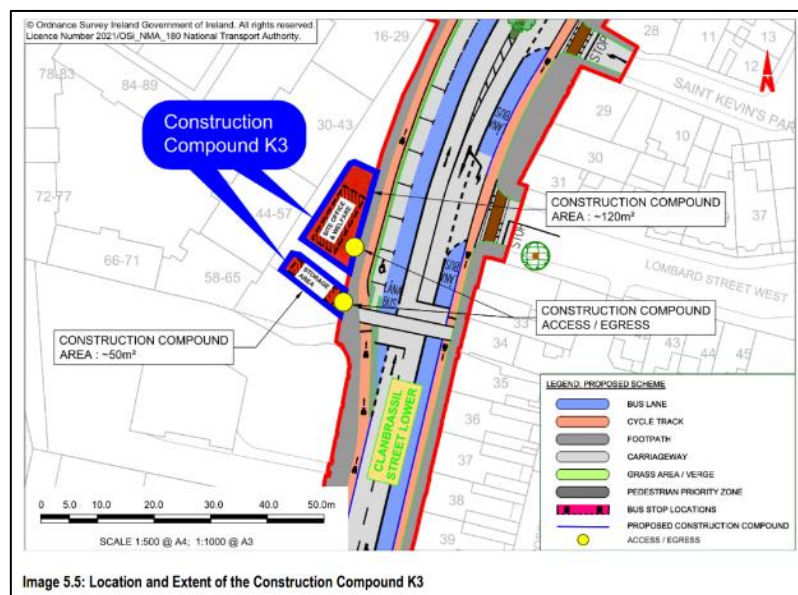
Construction Compound K3 at St. Patrick's Court
